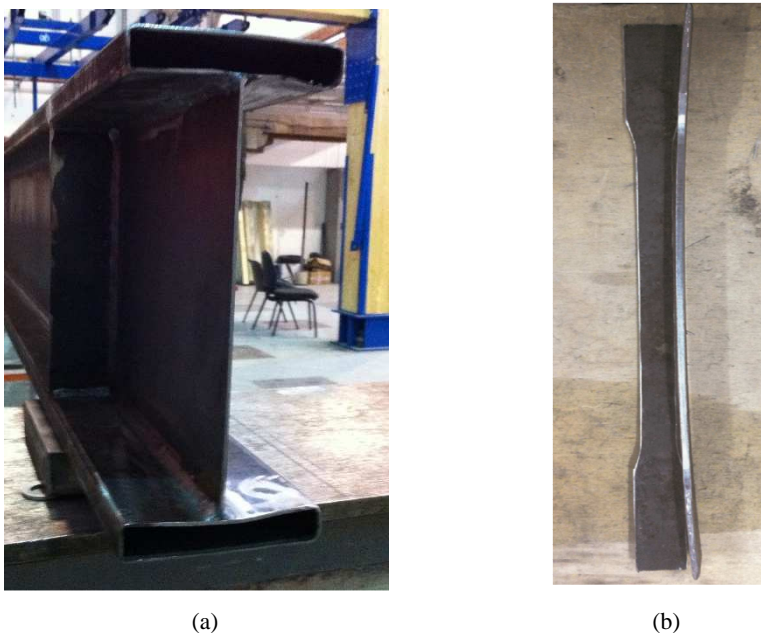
Beam tested specimens; a) View of the specimen cross section, b) Bending caused by flexural residual stresses released after coupon extraction
